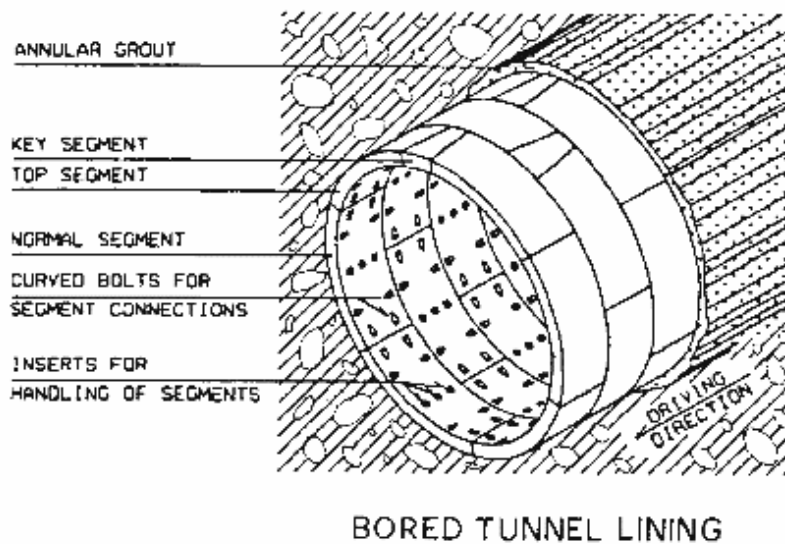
Precast segmental concrete lining with epoxy-coated fully welded reinforcement cages.
